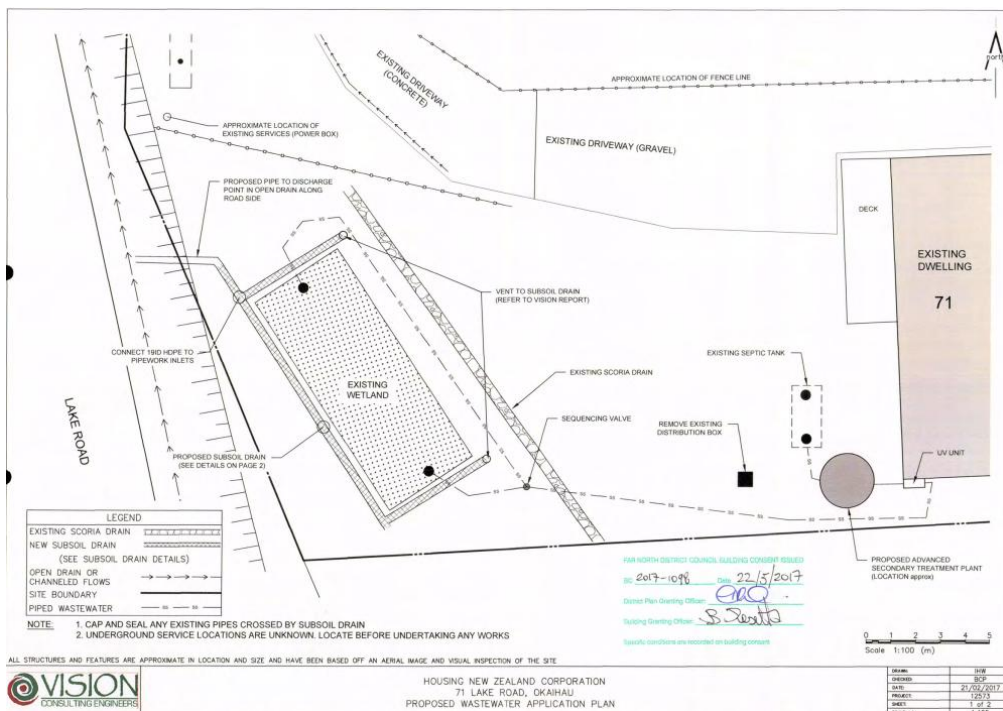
Approved Wastewater Design Plan for 71 Lake Road, Okaihau
